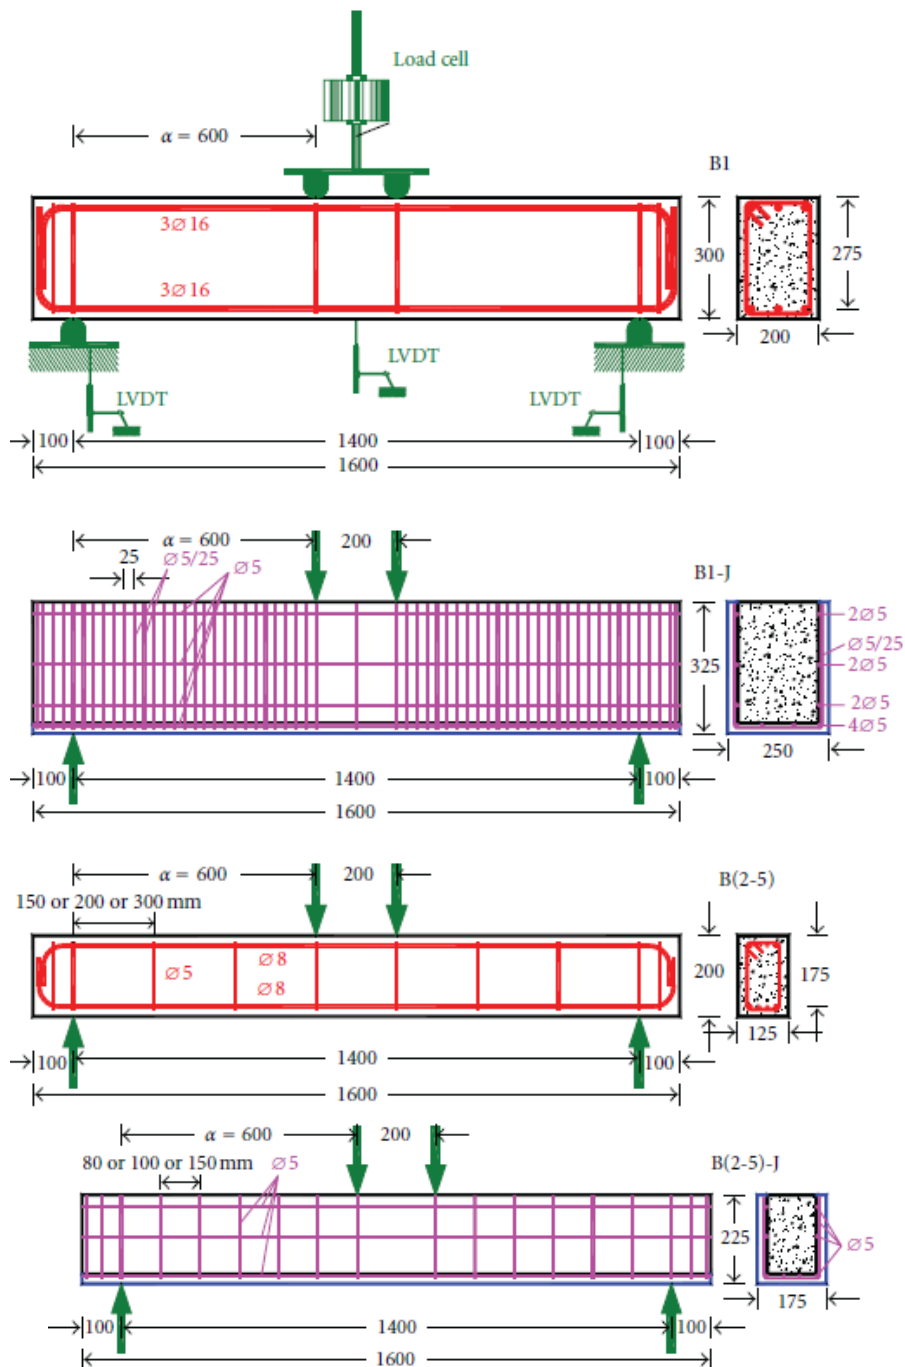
Geometry, test setup, and steel reinforcement arrangement of the tested beams (Chalioris and Constantin, 2012) - dimensions are given in mm.
